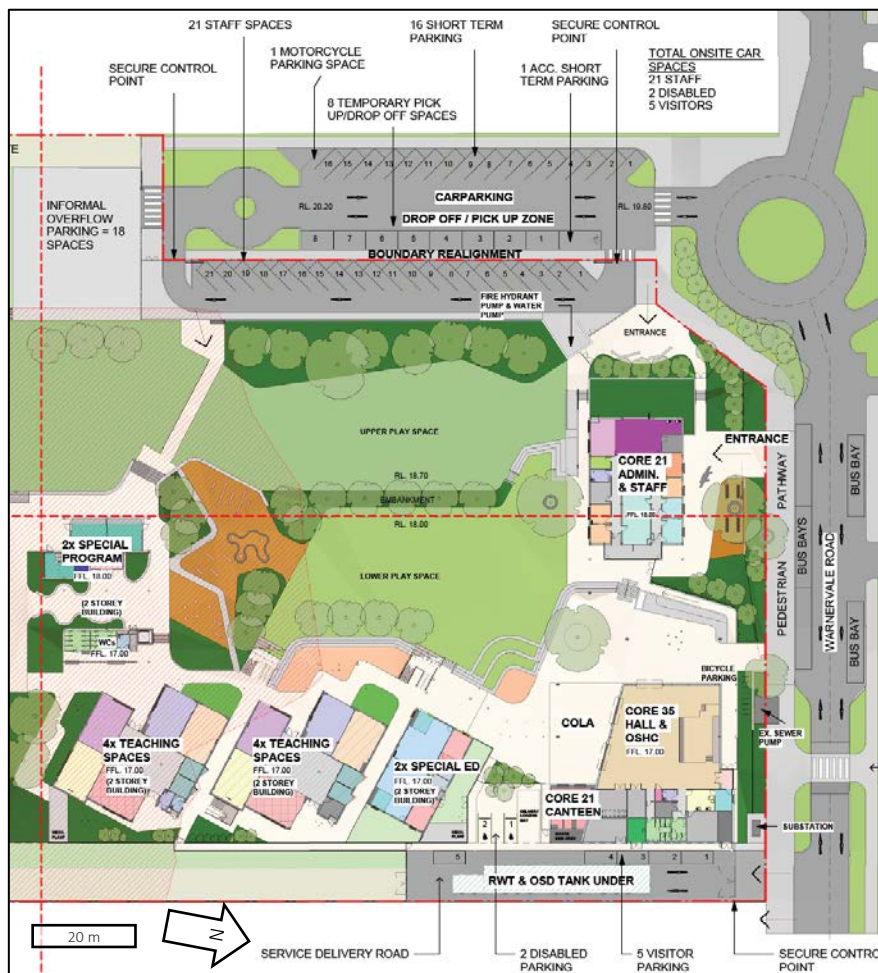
| Site layout showing car parking details (Source: Applicant's EIS 2019)
